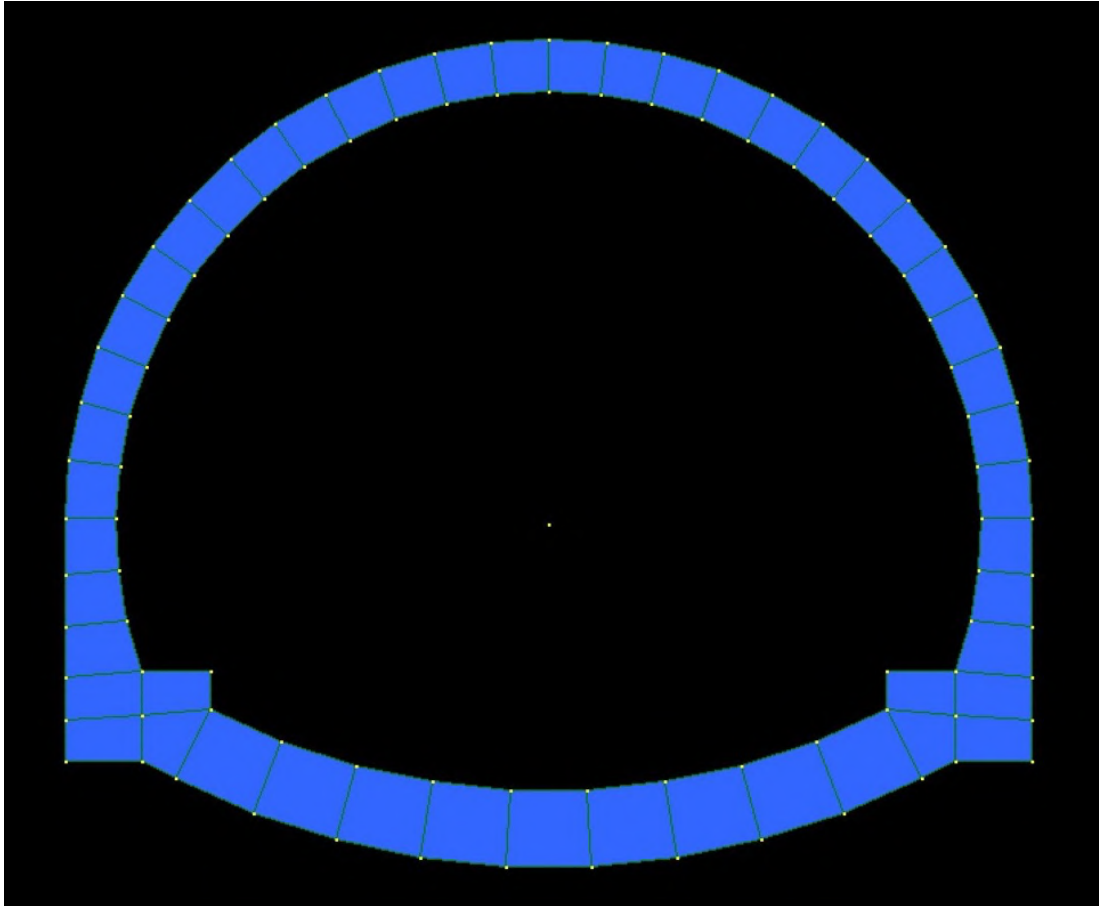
San Lorenzo tunnel cross-section with Straus7-created plates
